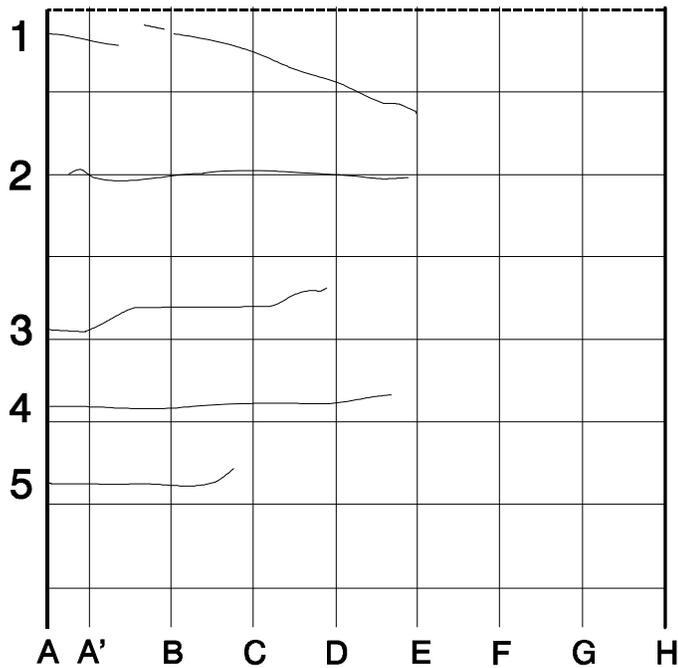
POJ-RC-100 cracking pattern for north face of pier at service load
